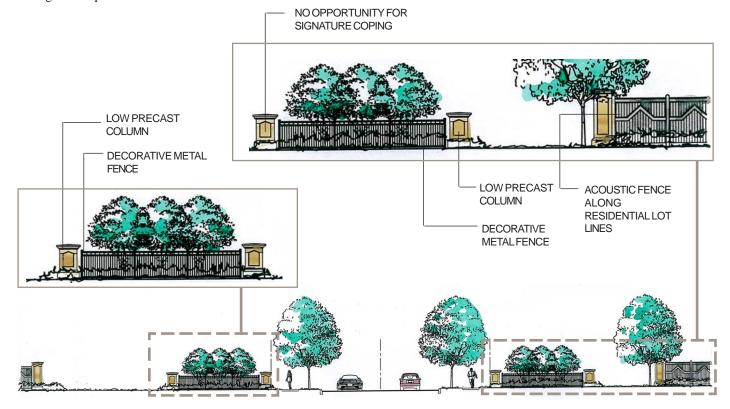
Creditview Road and Connector Road - conceptual street elevation.
